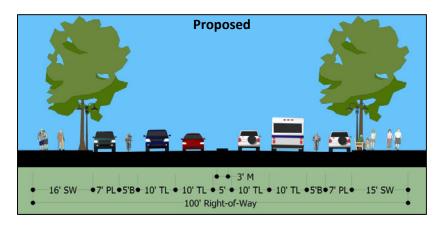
North San Fernando Boulevard: Typical Section from Scott Road to Amherst Drive (Looking Northwest)
